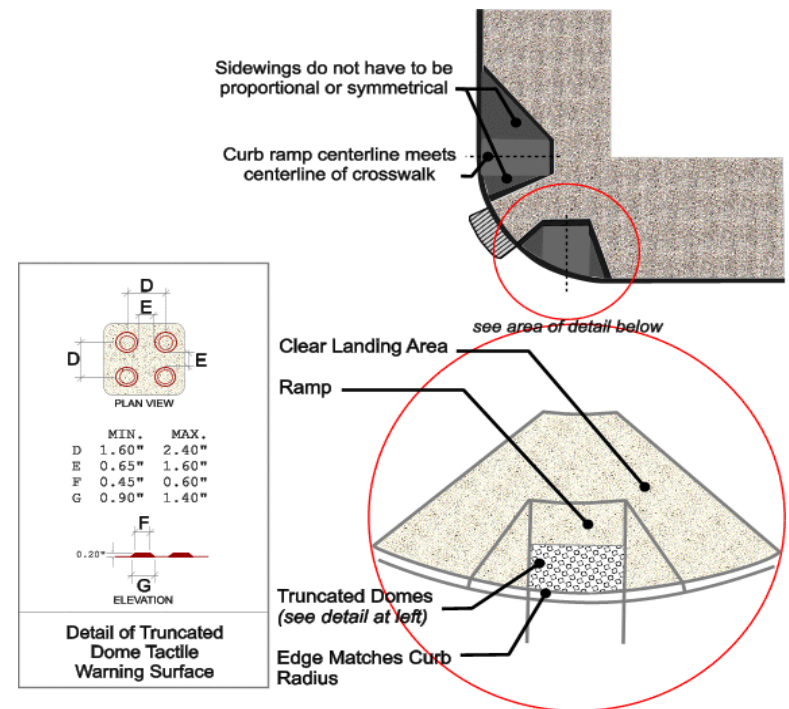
Detail of an ADA-complaint curb ramp design with truncated dome measurements.
